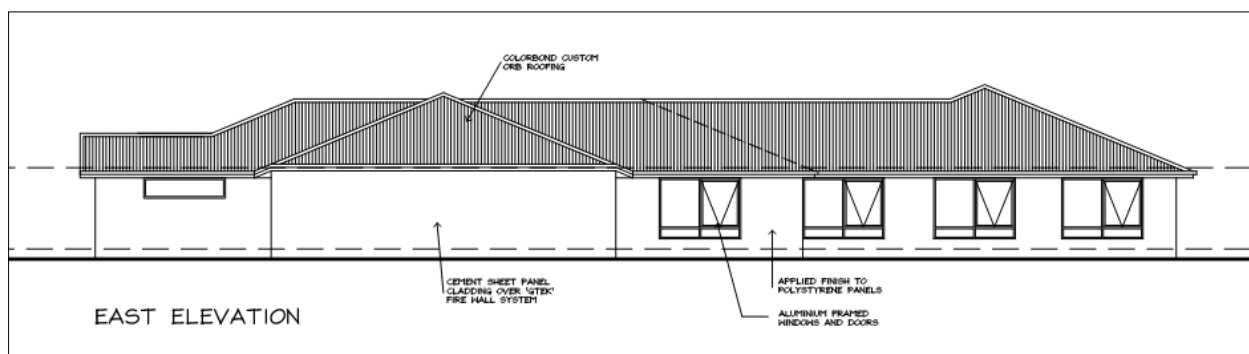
East elevation (Steven Penton Building Design, 2022)
